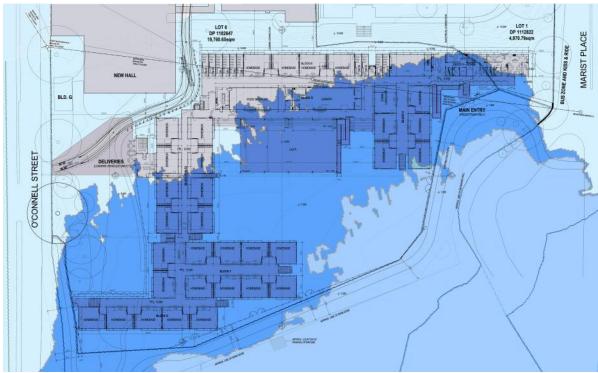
Flood Affectation Map 1 overlayed on proposed floor plan.
